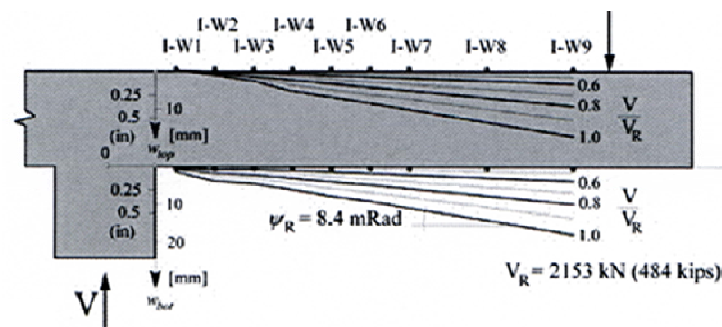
Deflection of slab-column connection (Guandalini et al., 2009)
